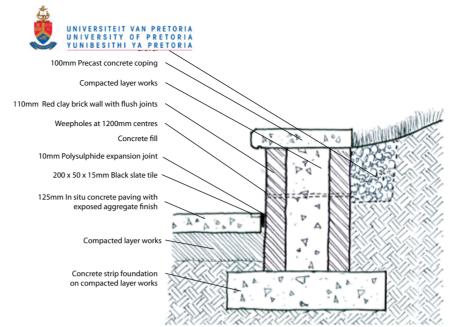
Detail A3 - Seating wall Scale 1:20
